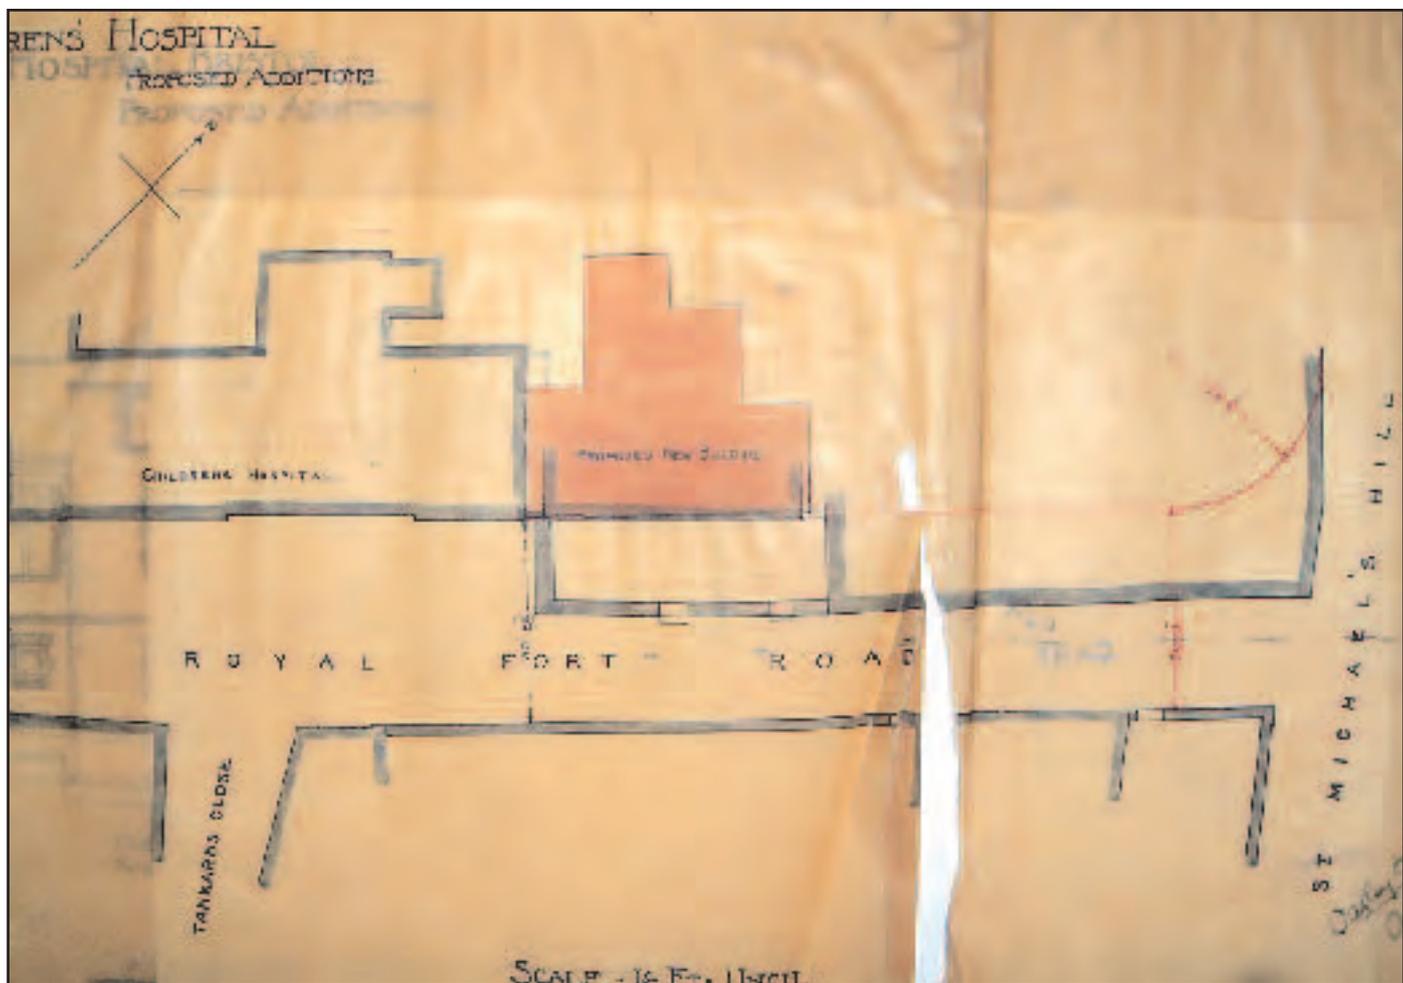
Children's Hospital, Royal Fort Road - proposed new building on old school site
